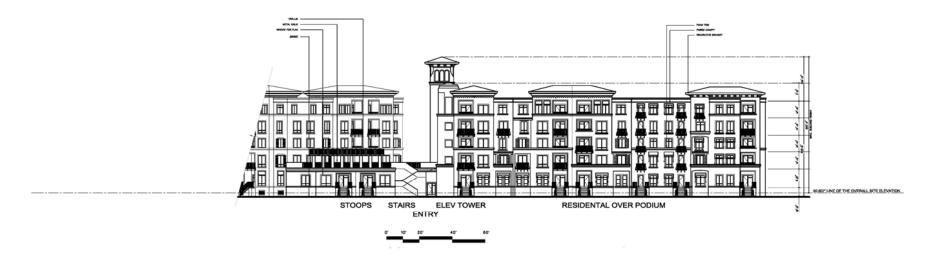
Conceptual Site Elevation – Scott Drive
